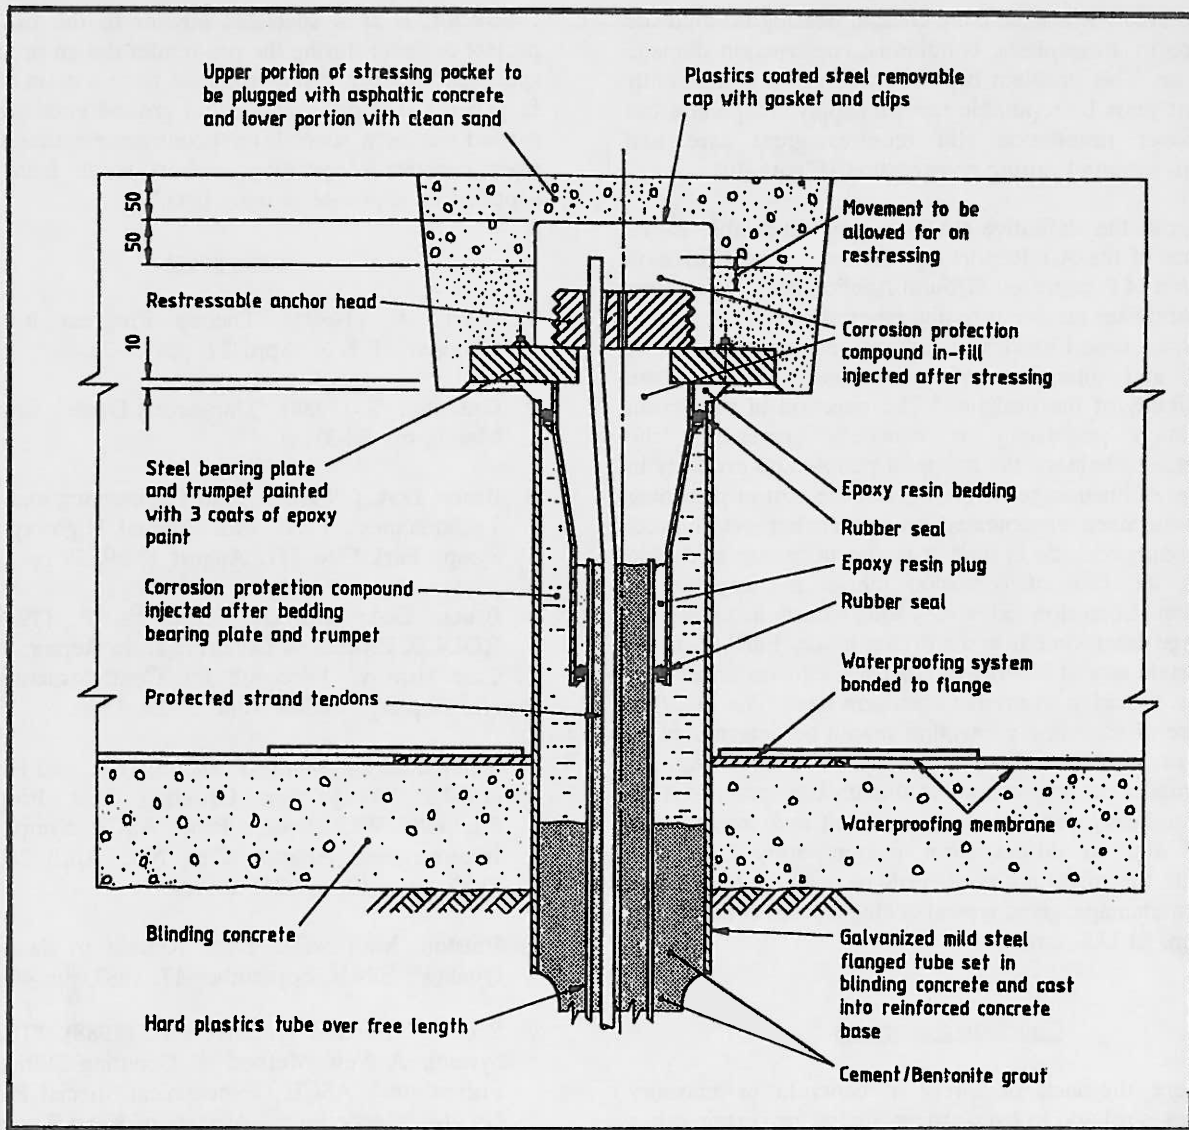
Typical anchor head detail for double corrosion protection of a restressable strand tendon in a water retaining structure²⁰.
